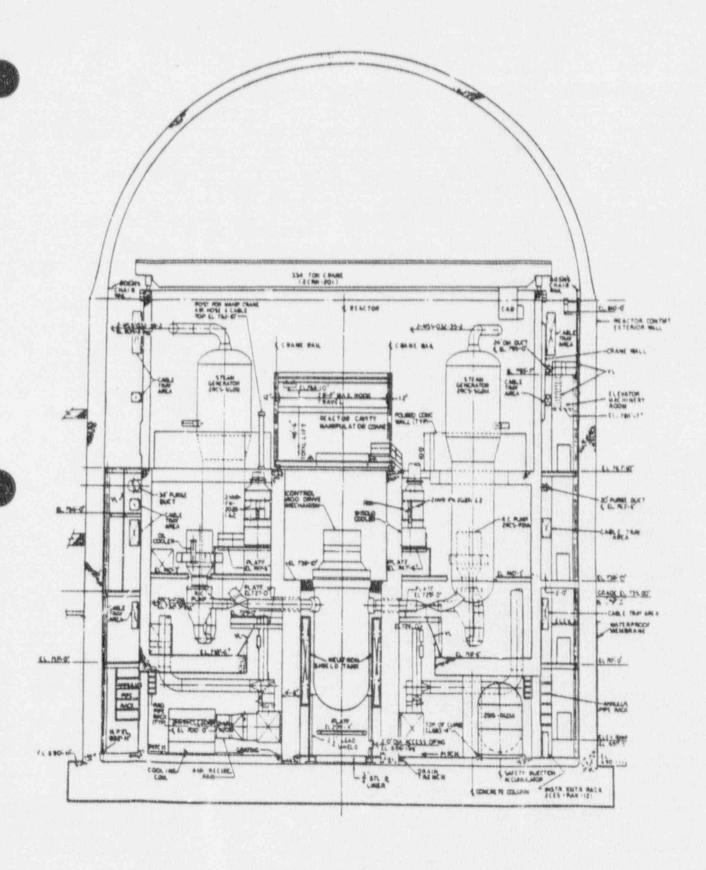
Section Views of Beaver Valley 2 Containment (Sheet 2 of 2)
